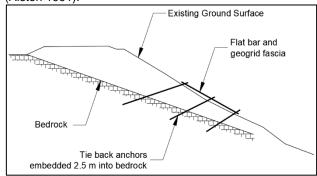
Cross section of tie bank anchors and flat bar / geogrid fascia
